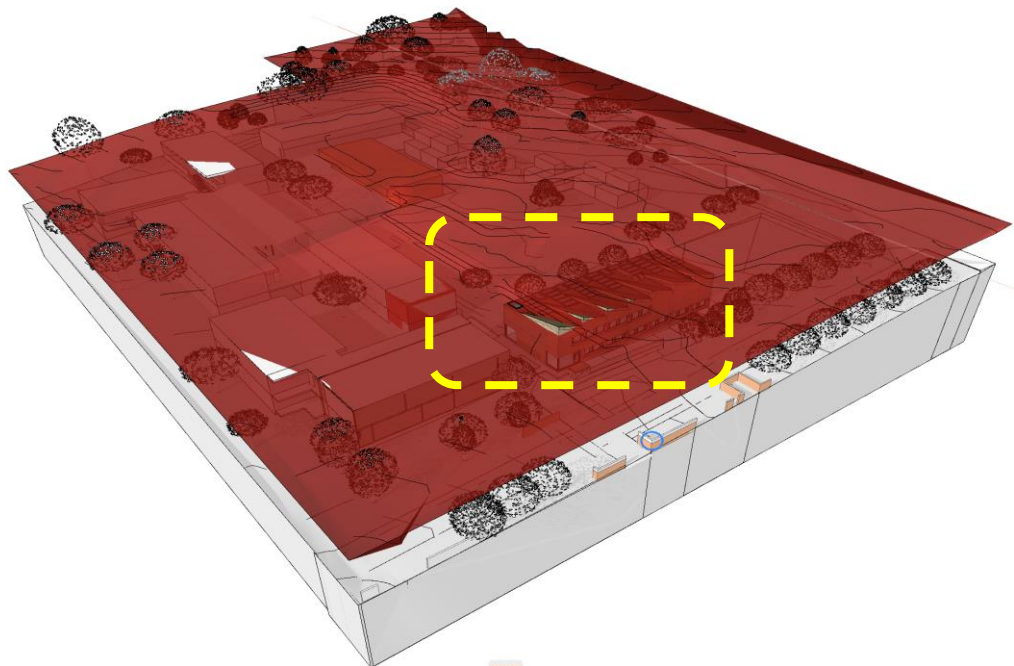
Building height plane showing the portion of the building that exceeds the maximum building height (Source: Betti&knut architecture)
